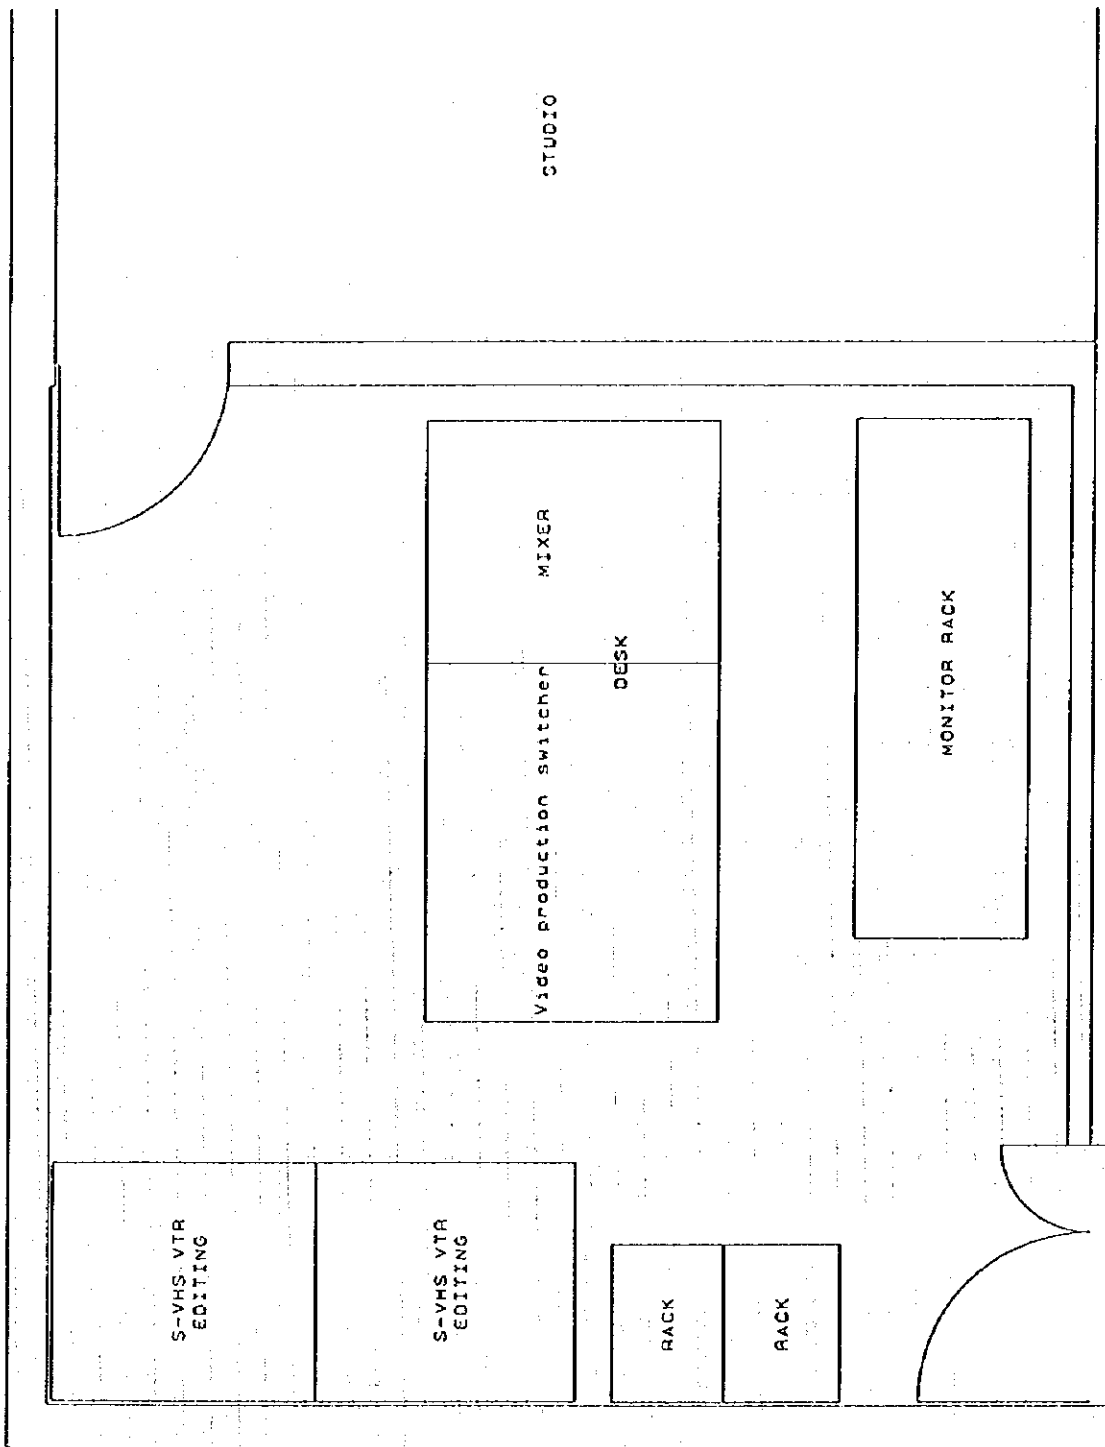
SIHANOUKVILLE TV STATION, EQUIPMENT LAYOUT
